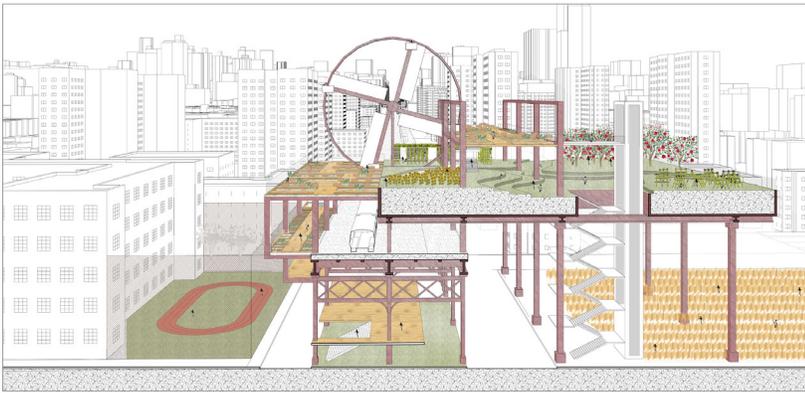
Xiaotong Wang, Guoyu Wang, Caitlin Zhang, Junda Liu, Section and Axon of Park Avenue
